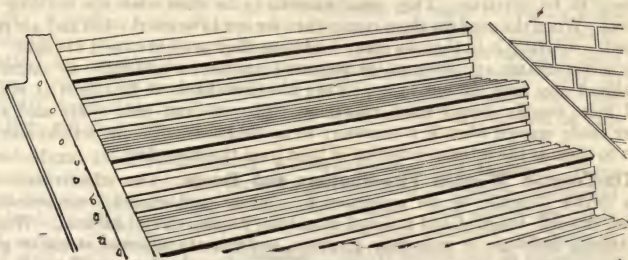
Ferroinclave Foundation for Stair-treads and Risers
